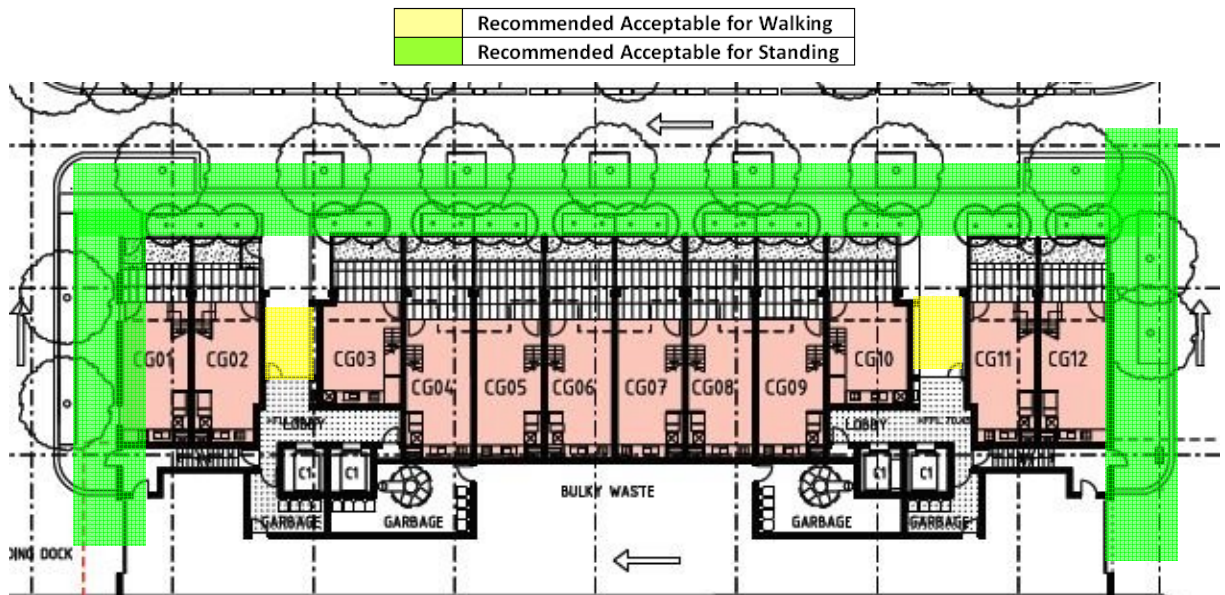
Schematic plan view of the proposed Building C with the recommended wind criteria overlaid on adjacent ground level areas.
